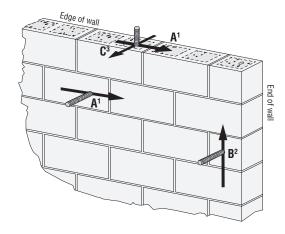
B. Allowable Anchor Locations of 7/6"-Diameter Threaded Rod and #4 and #5 Rebar for Full and Reduced Load Capacity When Installation Is in the Top of Fully Grouted CMU Masonry Wall Construction
